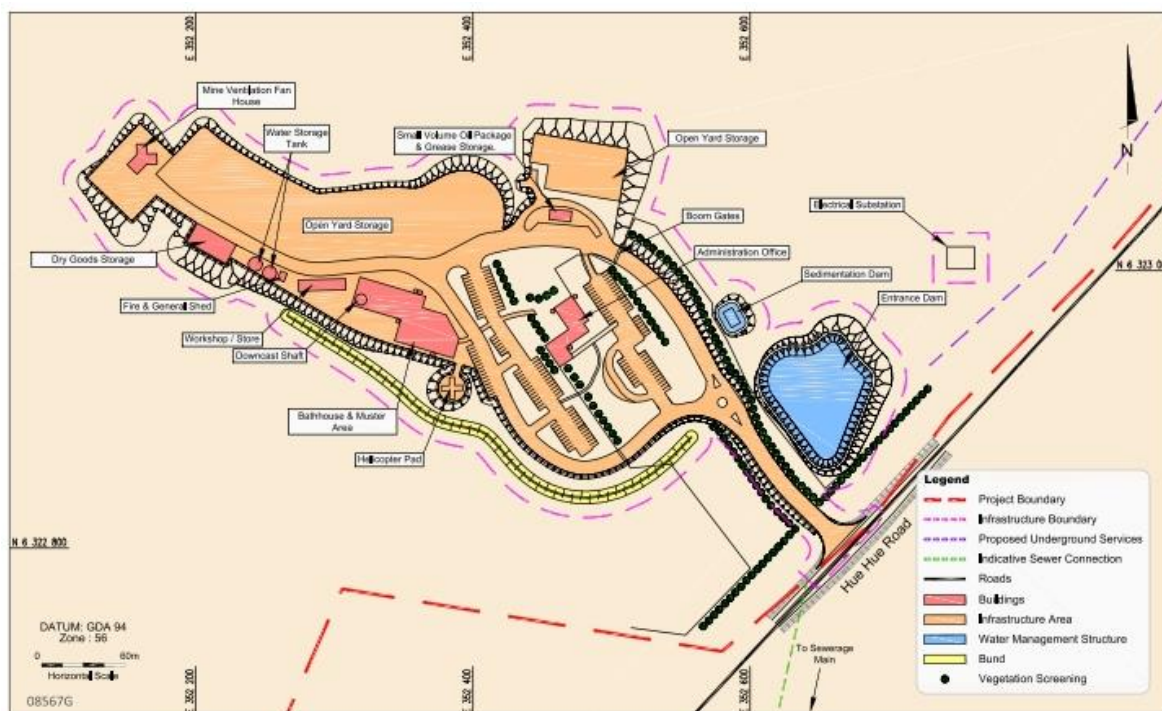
Buttonderry Site (Hansen Bailey, 2013a)
